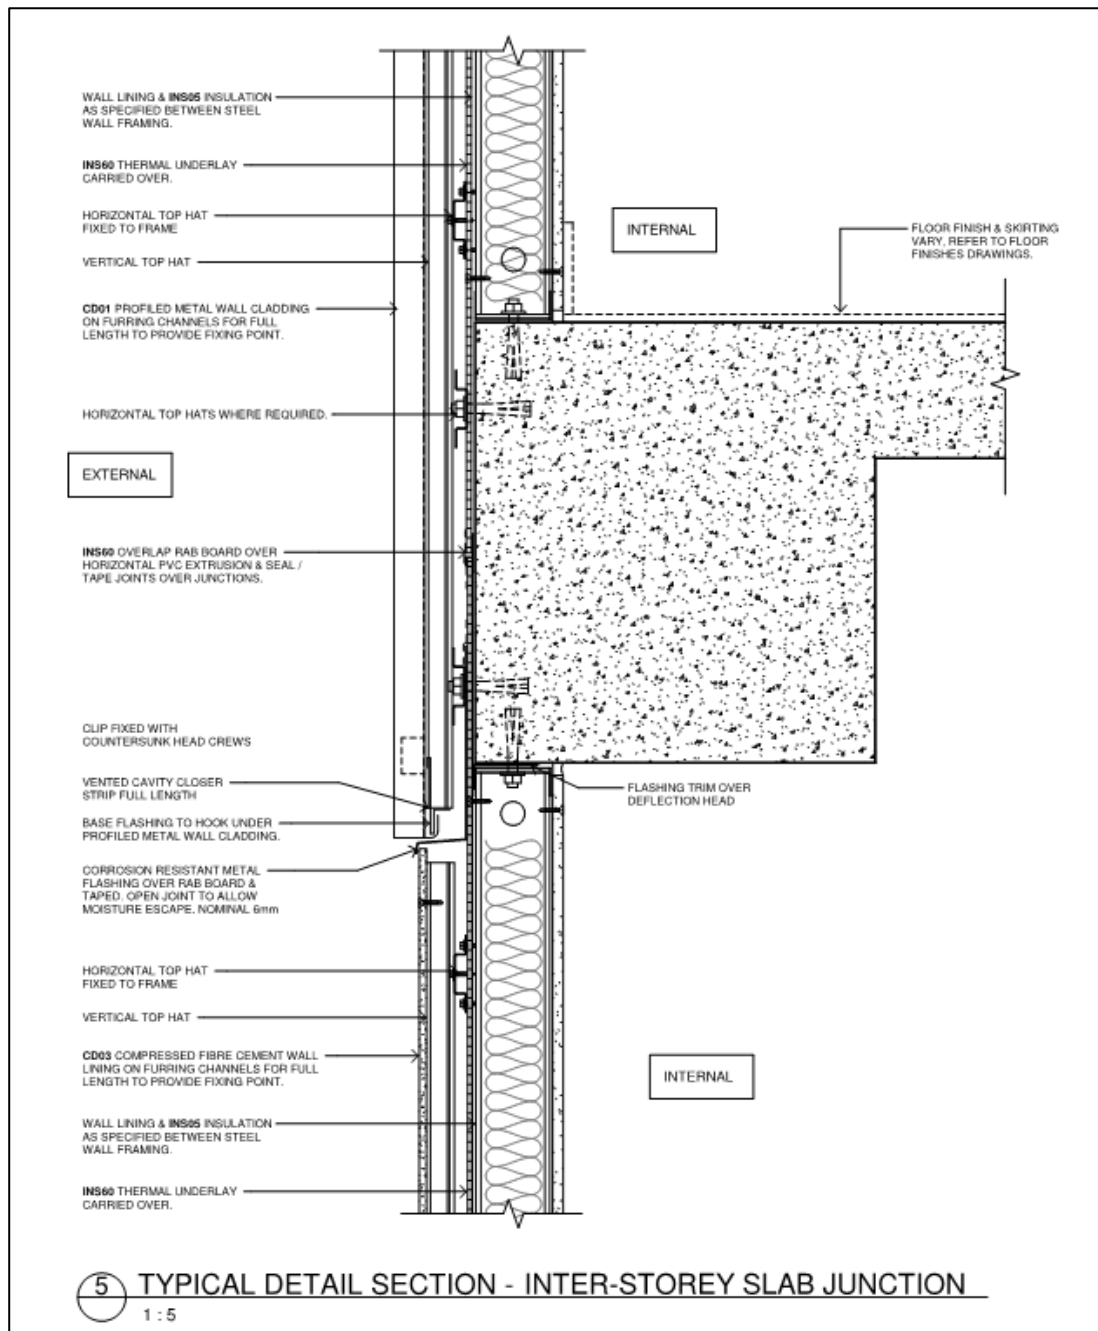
Source – Plan M-AR-DW-5103 Typical Details – Sheet 3
